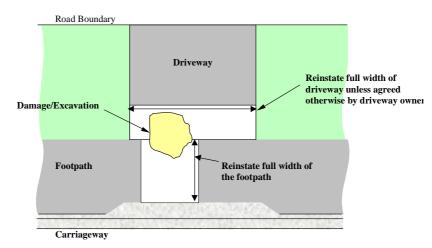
Excavation/Damage in footpath or driveway
